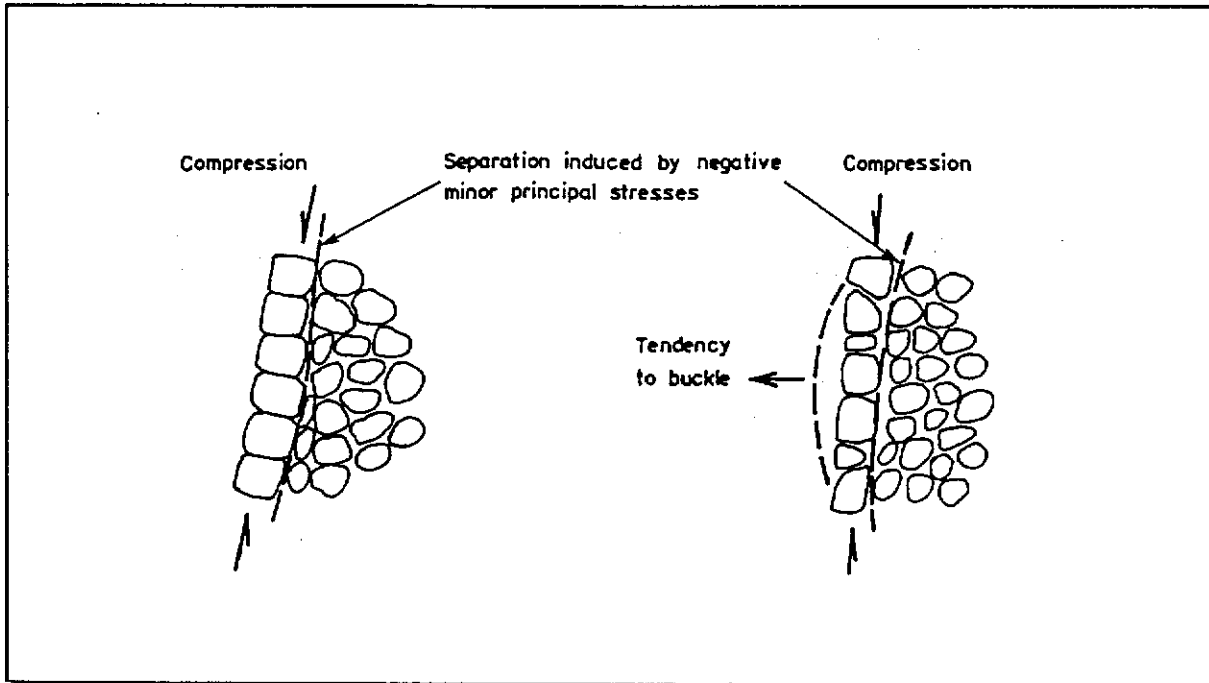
Effect of Block Shapes on Buckling of the Face Layer of Stone Rubble Blocks in Masonry Retaining Wall
